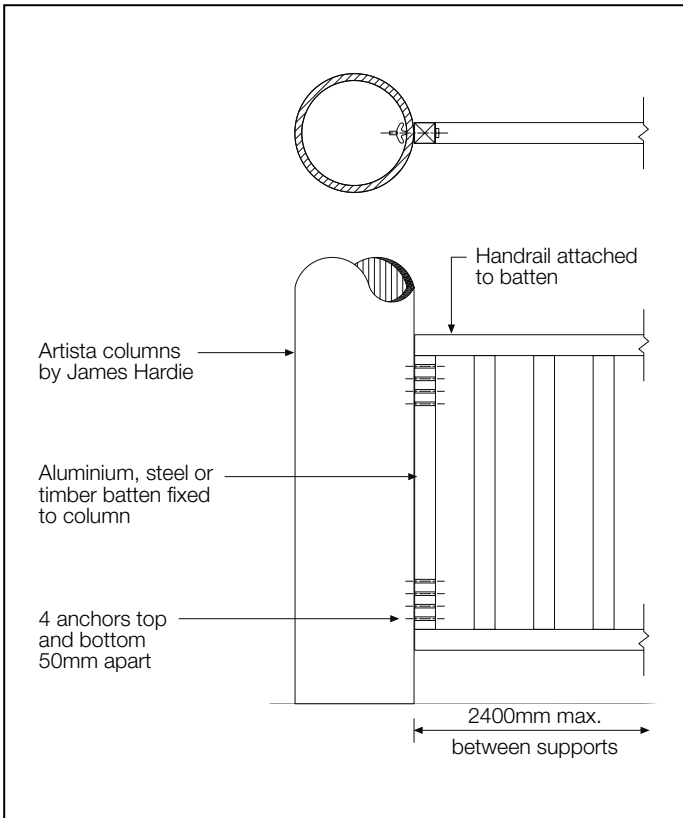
HANDRAIL FIXING MEMBER CONNECTION DETAIL
